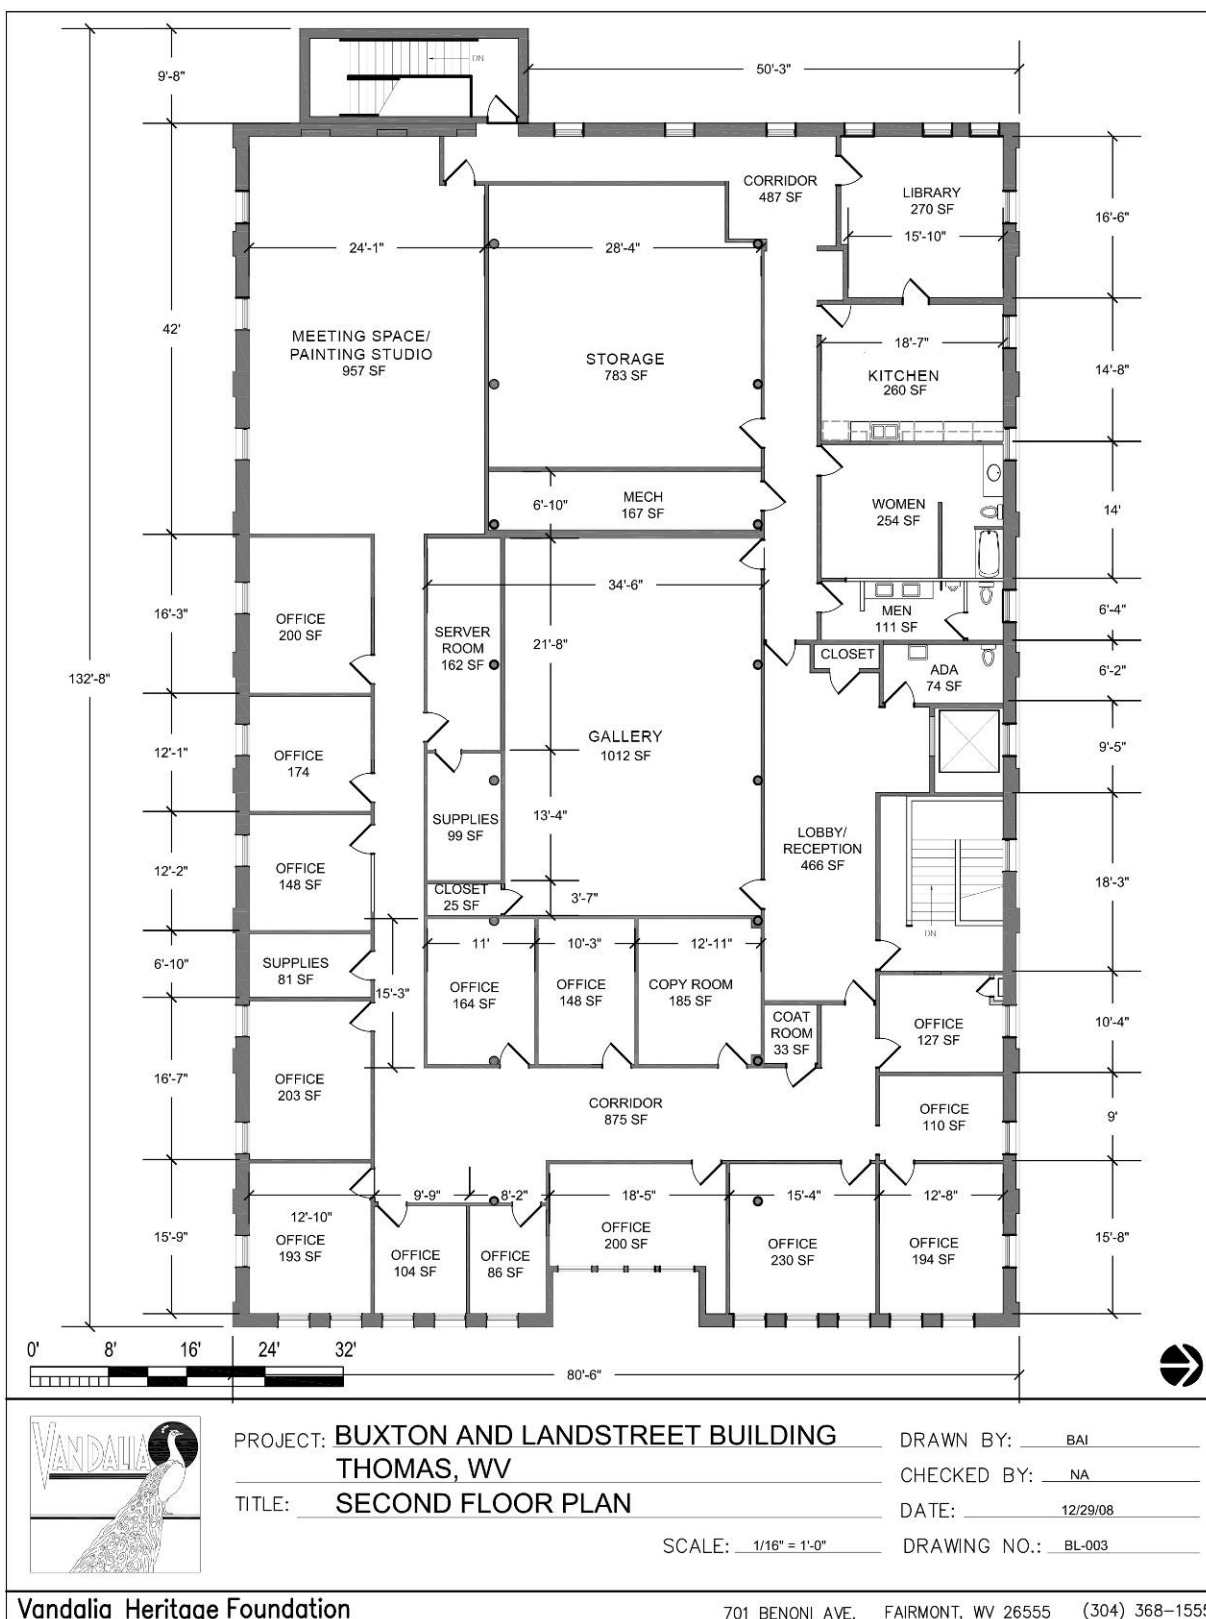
Buxton and Landstreet Company Store Floor Plan, Second Floor
